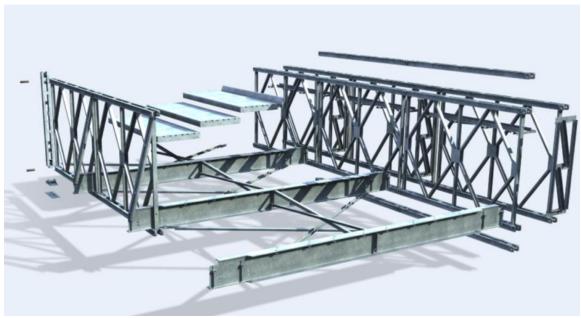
Bailey Bridge Model by Mabey (Mabey Bridge, 2019)
